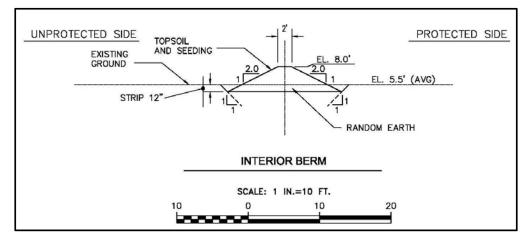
HSLRR Recommended Plan Interior Berm (Elevations in ft. NGVD29)
